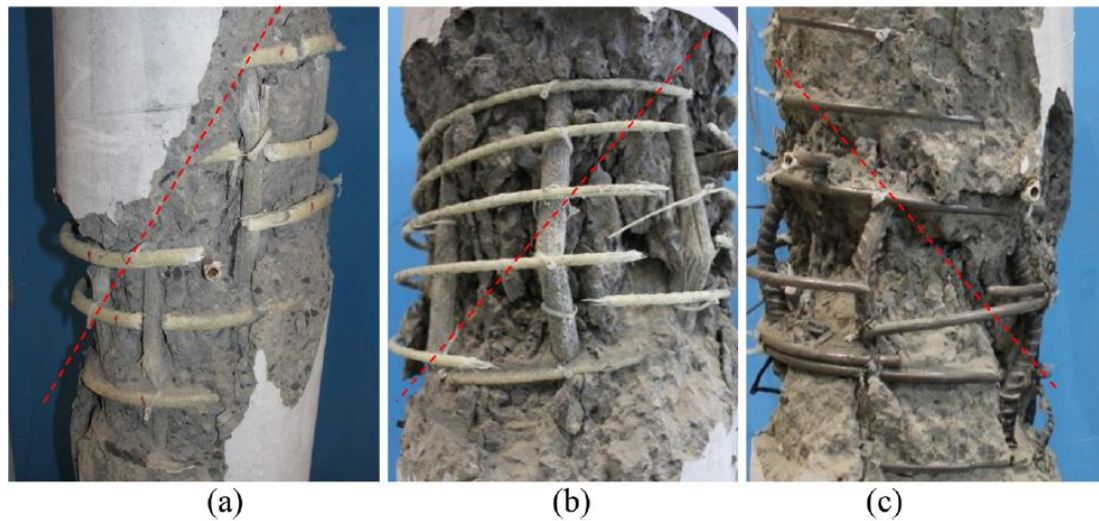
Failure of the RC columns: (a) rupture of GFRP helix; (b) buckling and rupture of longitudinal GFRP bars; and (c) buckling of longitudinal steel bars and rupture of helices⁴⁷
